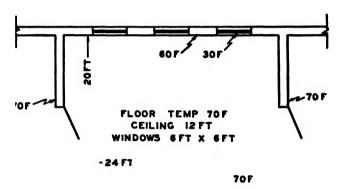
Room Plan Used for Illustration of Method of Designing a Panel Heating System
